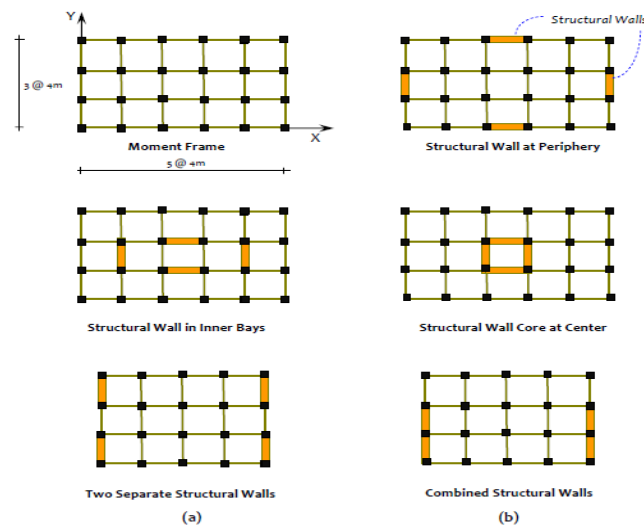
Position of shear walls in a moment resisting frame building
